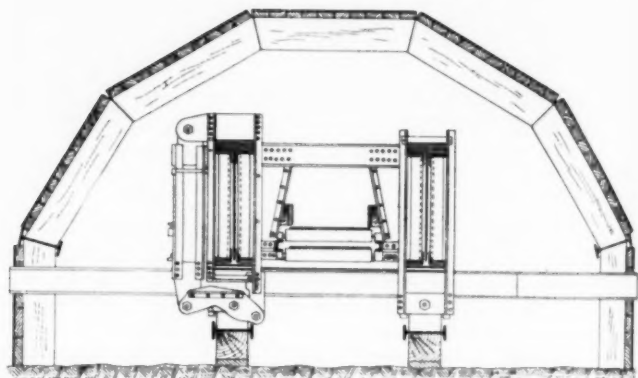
SECTION OF LEWIS TRAVELING CANTILEVER GIRDER, SHOWING BELT CONVEYOR FOR REMOVING MUCK FROM HEADING
